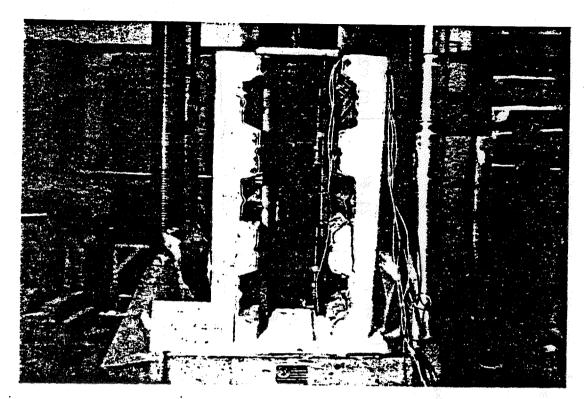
Photograph Showing Shearing of Concrete Rib, Failure Mode Cl
